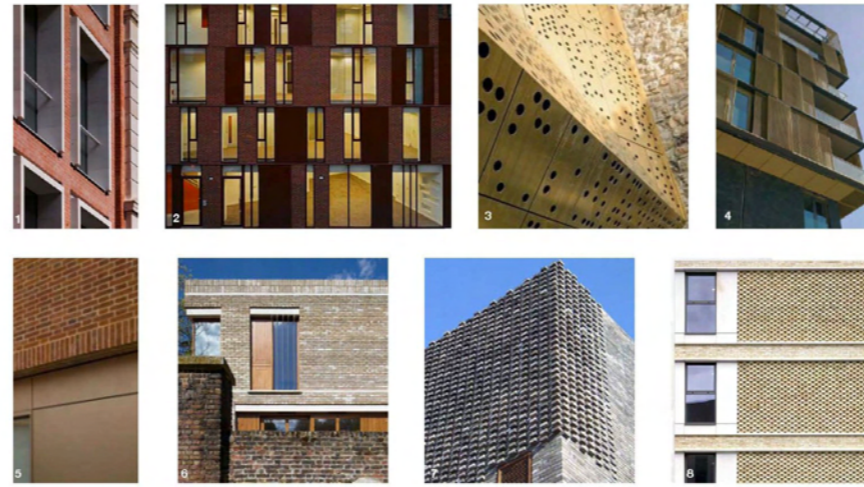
Detail taken from the Design and Access Statement, showing the concept behind the materials and detailing to be used on the main elevation of the building.
